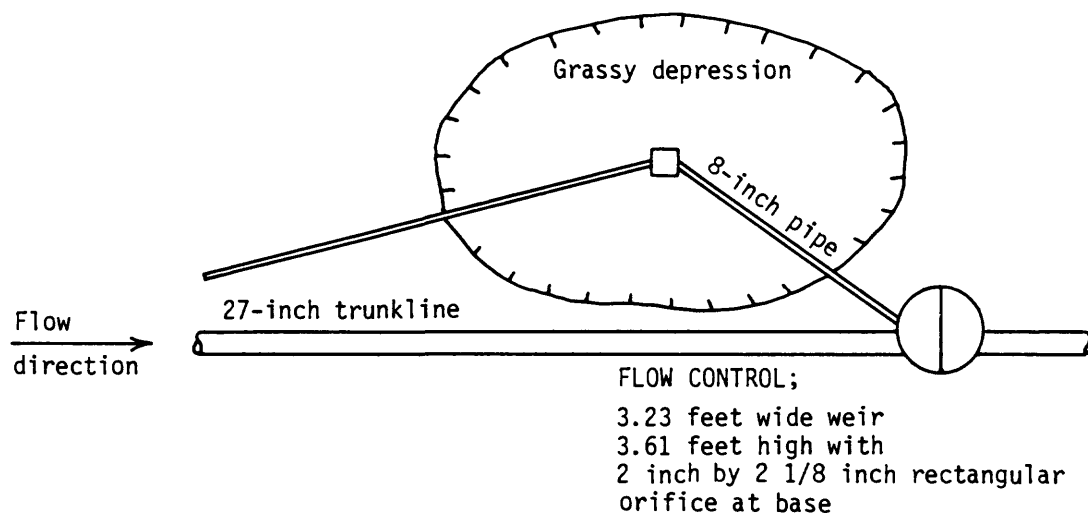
Schematic plan drawing of basin No. 5 of the storm-water detention system in the 148th Avenue SE catchment. Flow control was modified as shown for this study.
